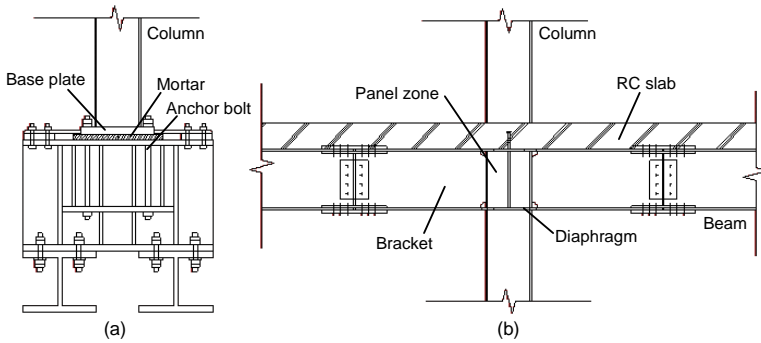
Connection details: (a) column base connection; (b) beam-to-column connection.
